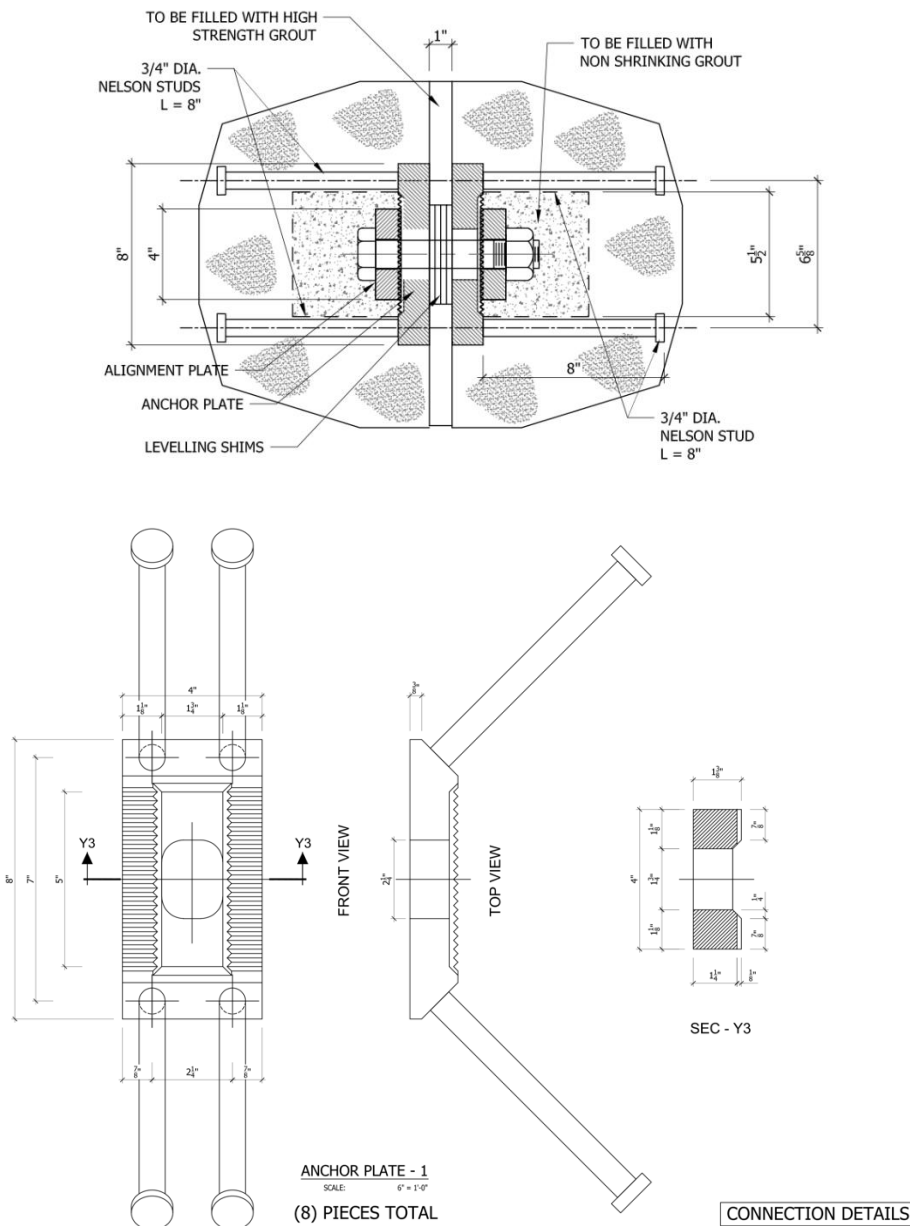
Mechanical Joint with 8 in. Nelson Studs
